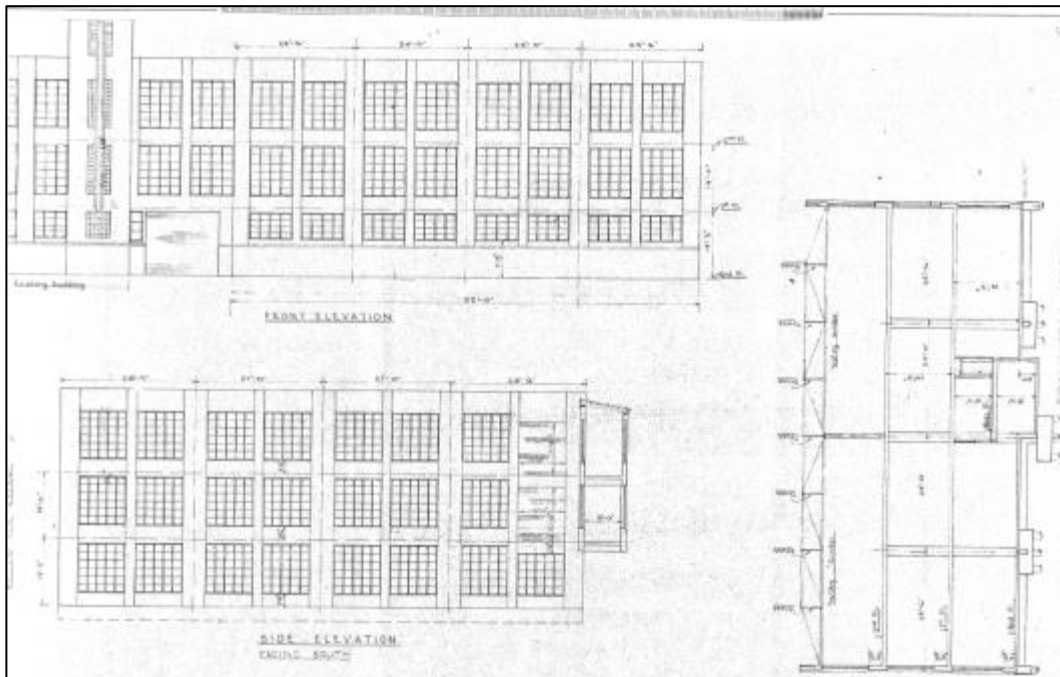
1961 plans for engineering workshop, labs and offices building (DCC Archives).
